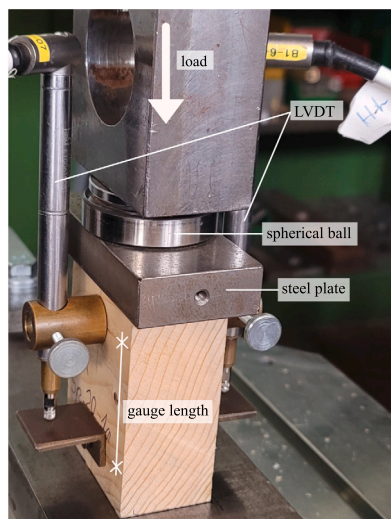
CPG testing on the board scale: experimental setup in the uni-axial testing machine.
